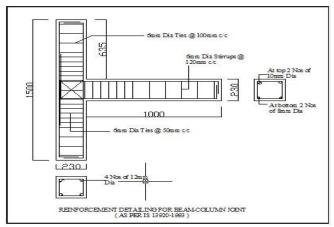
Reinforcement Detailing as per IS 13920: 1993
